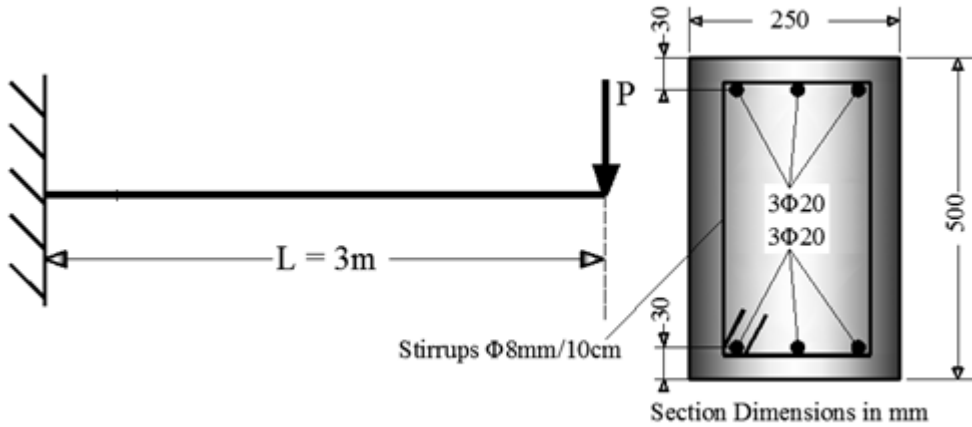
CANTILEVER RC BEAM. GEOMETRIC AND REINFORCEMENT DETAILS.
